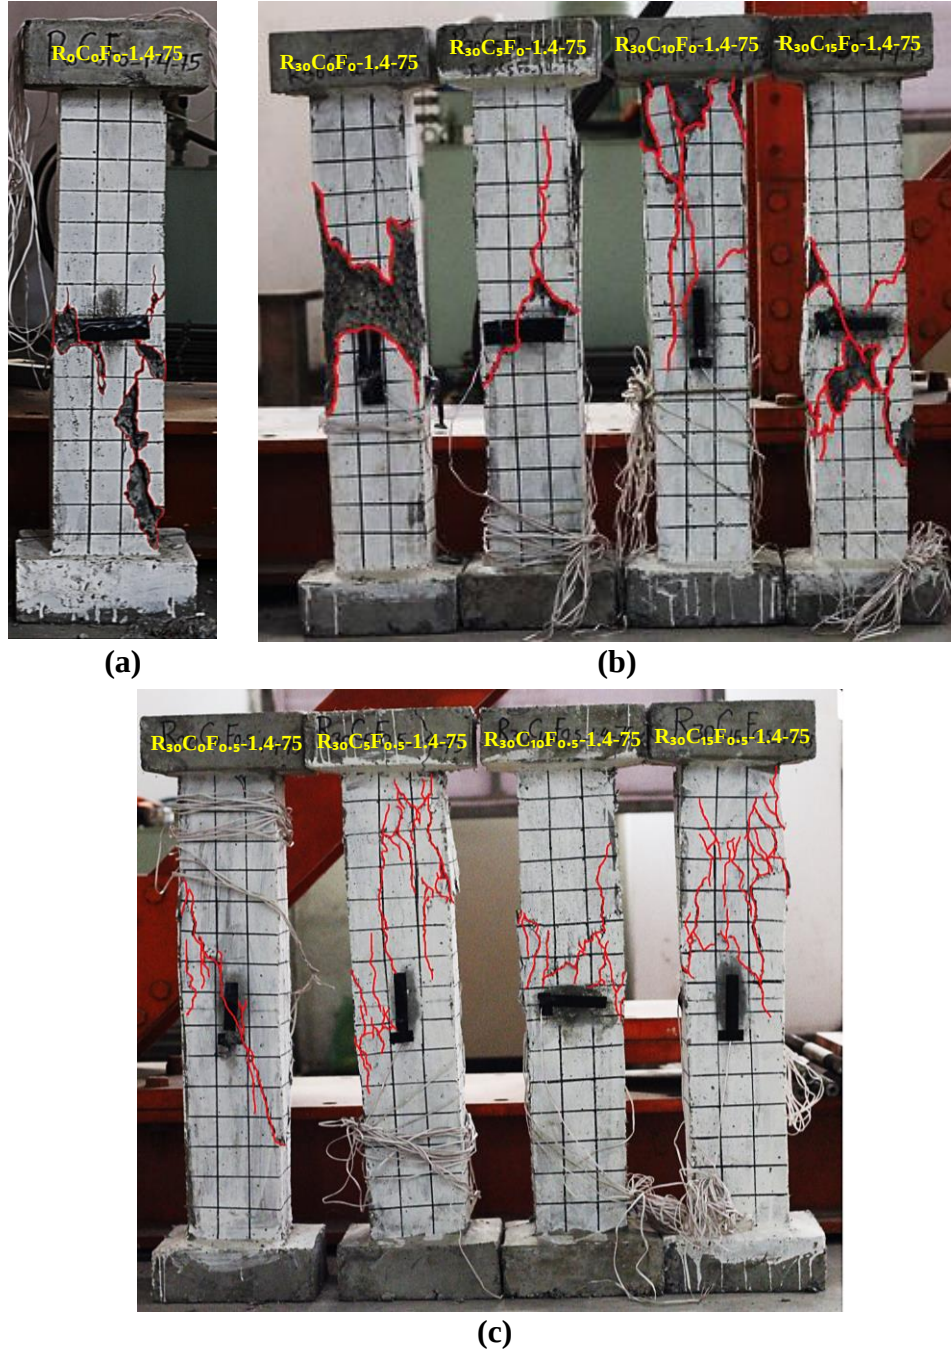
Failure mode of columns containing 1.4% longitudinal reinforcement with 75 mm tie spacing: (a) control column, (b) R²C columns, and (c) FR³C columns.
